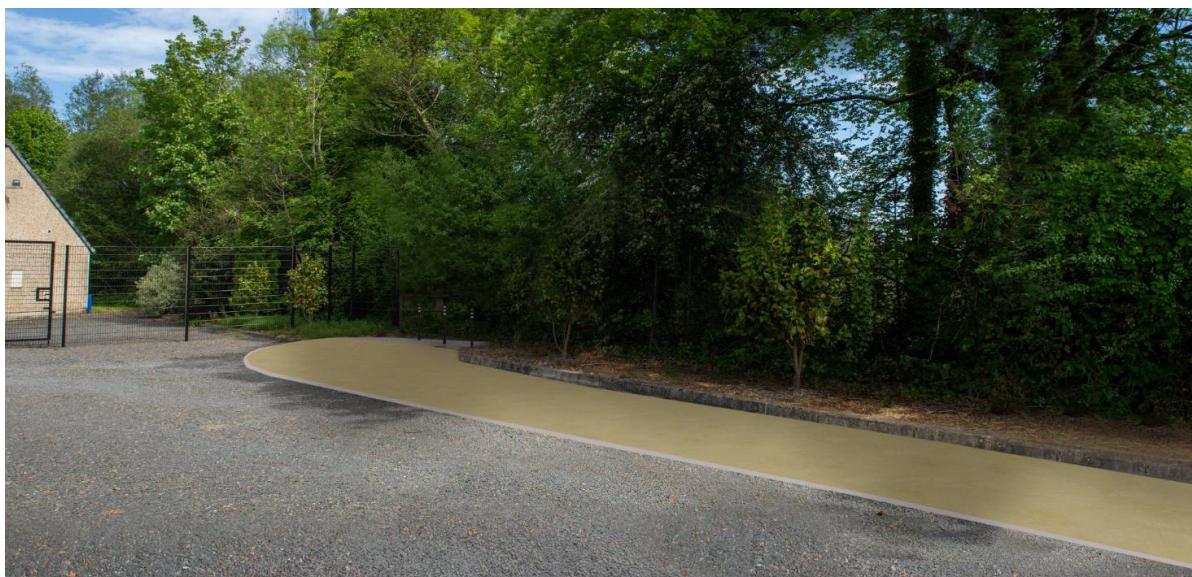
Proposed Greenway at UL Agricultural Laboratory building east of Kilmurray Student Village
